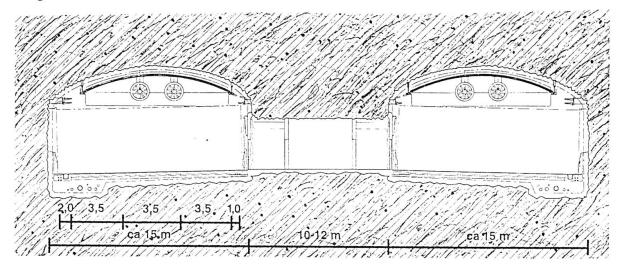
The main tunnels are housed in two parallel tubes. This drawing illustrates a section where there are three carriageways in each tube as well as an emergency evacuation passage running between the two tubes.
